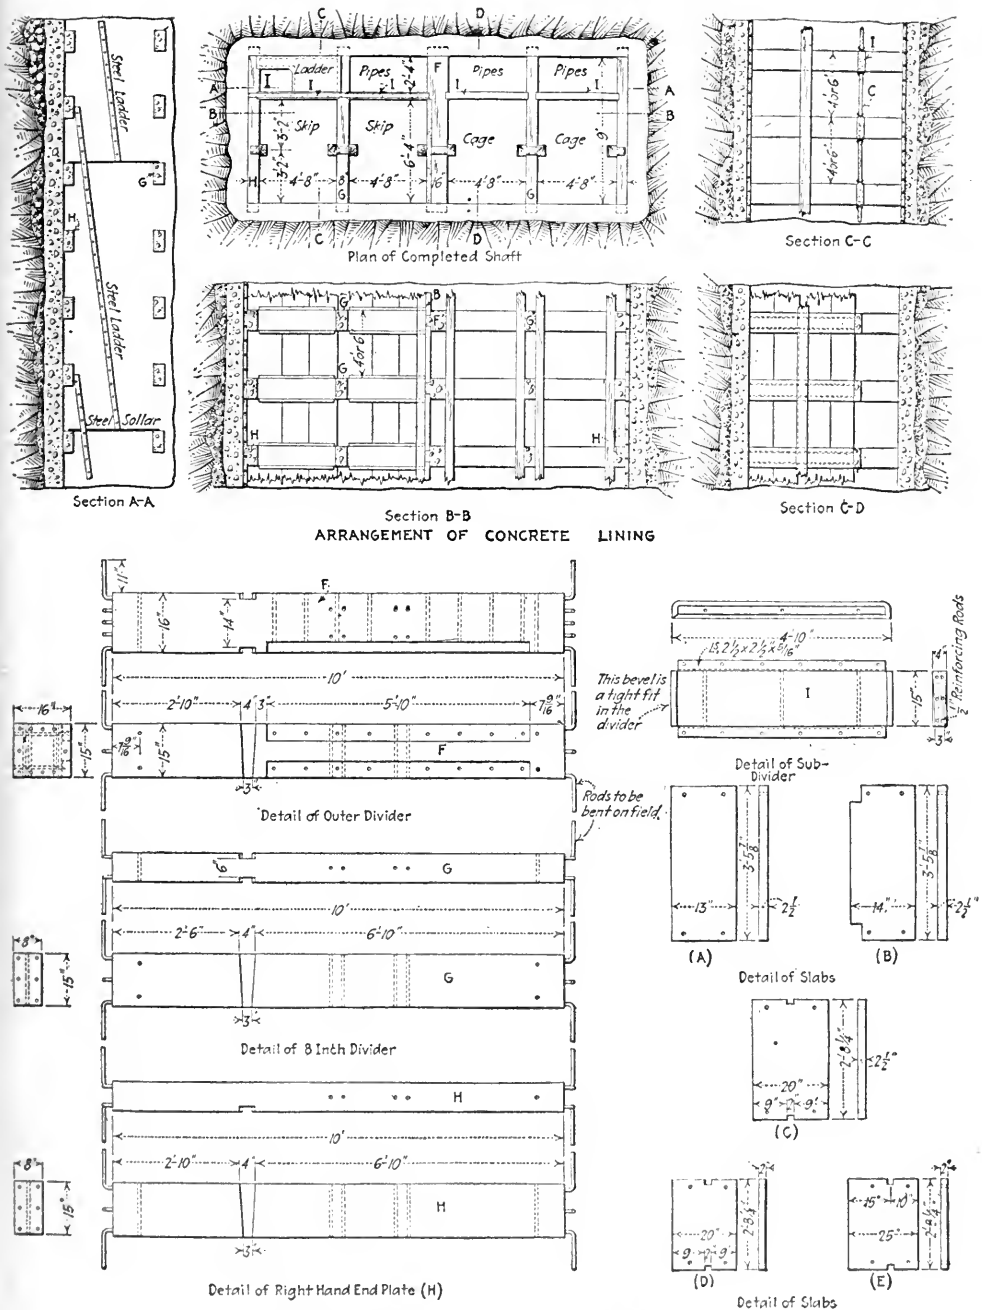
NEW CONCRETE LINING OF HAMILTON SHAFT, IN DETAIL AND ASSEMBLED.
